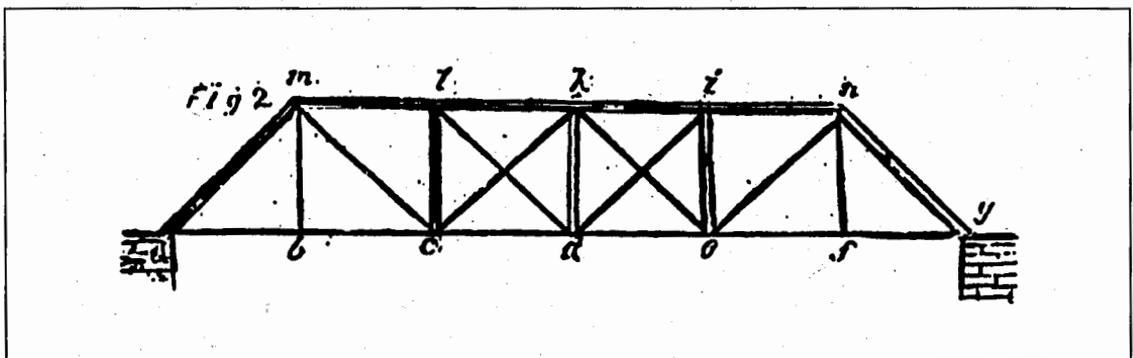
The "new" Whipple trapezoidal or Murphy-Whipple truss, replacing the Pratt.
